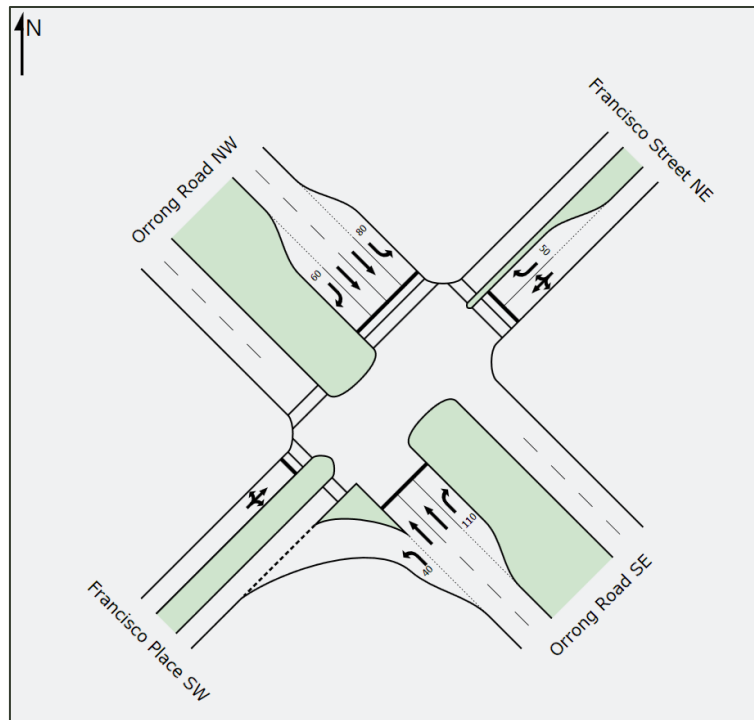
Orrong Road/ Francisco Street intersection layout
